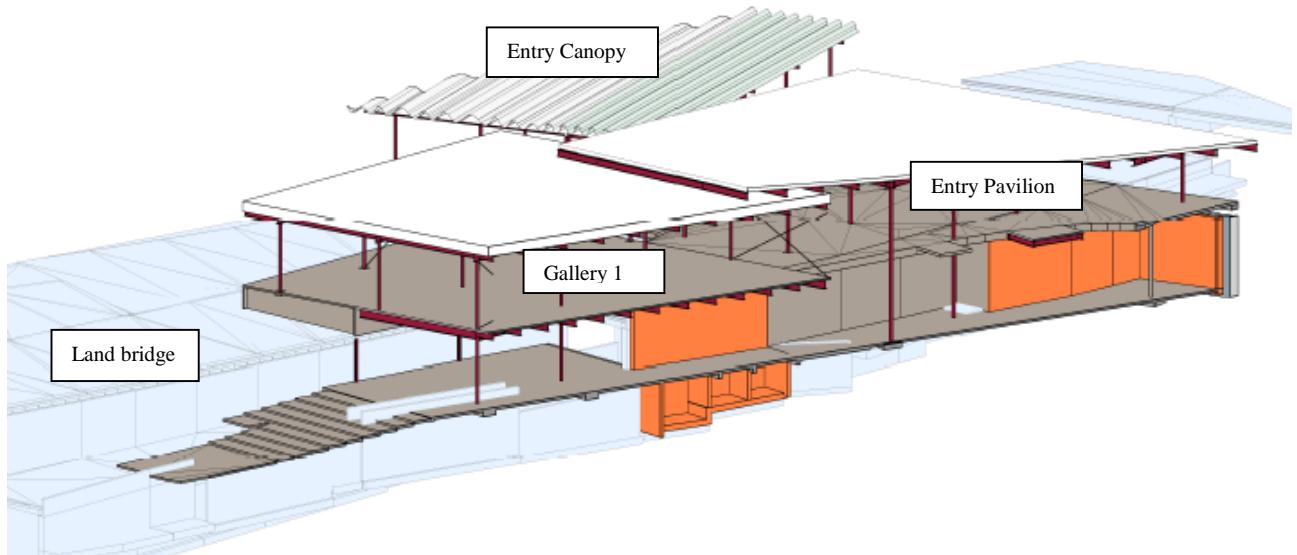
Key stability walls (orange). These elements resist lateral loading from new structures supported by land bridge under gravity (i.e. northern parts of Entry Pavilion and Gallery 1).
